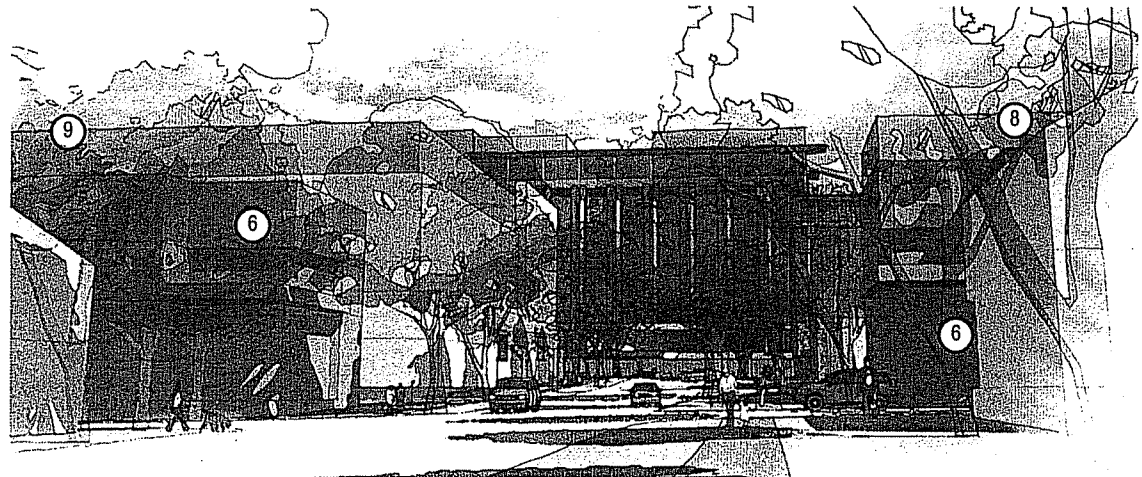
Street level view of Mound Street, West of Mills Street, showing possible development massing.
